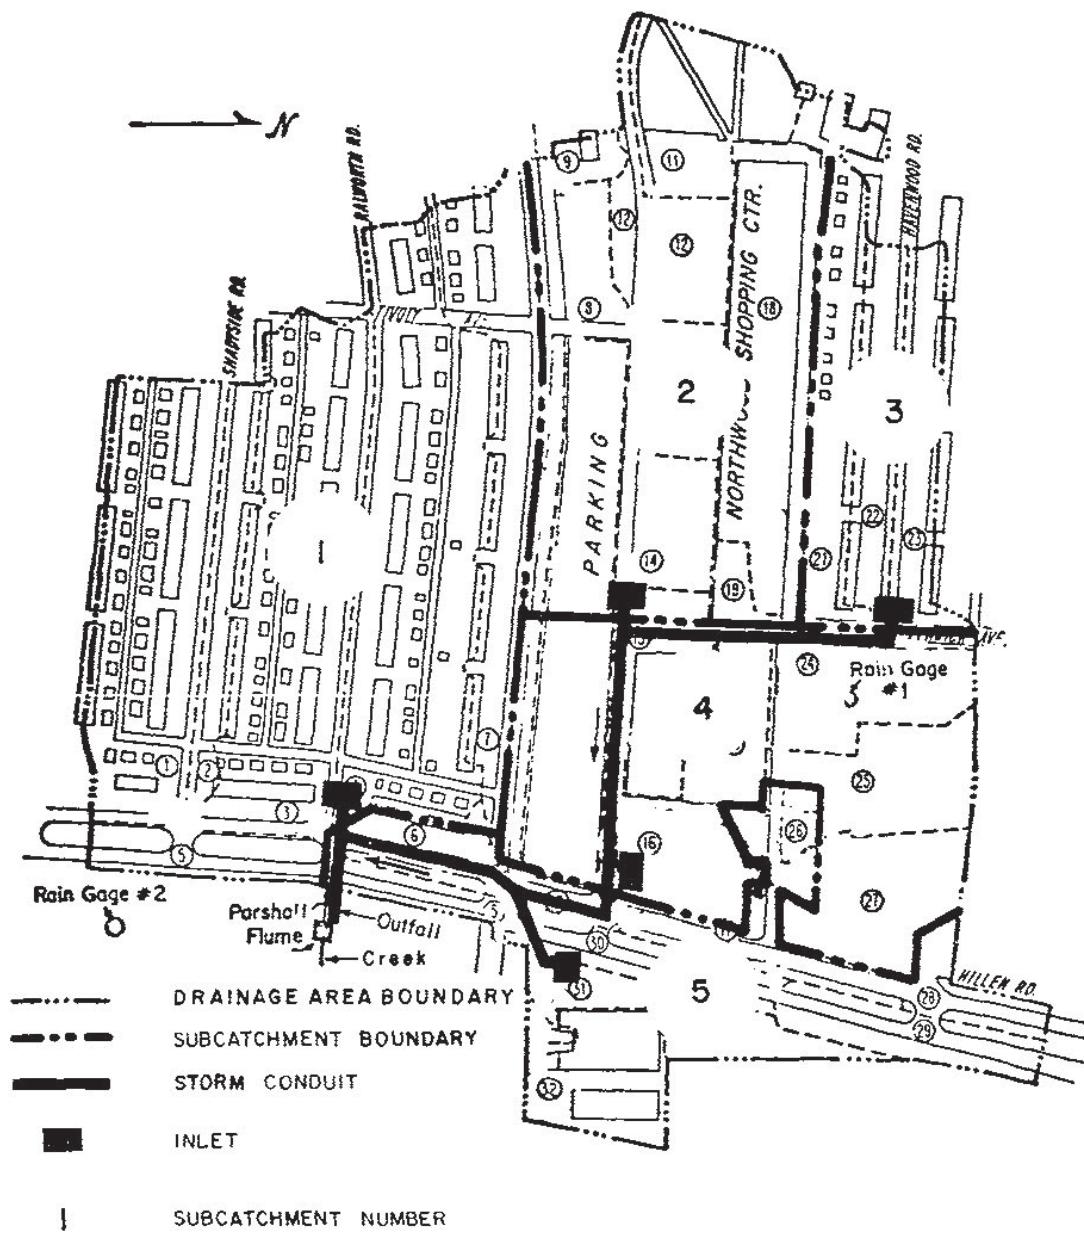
Northwood (Baltimore) Drainage Basin "Coarse" Plan
